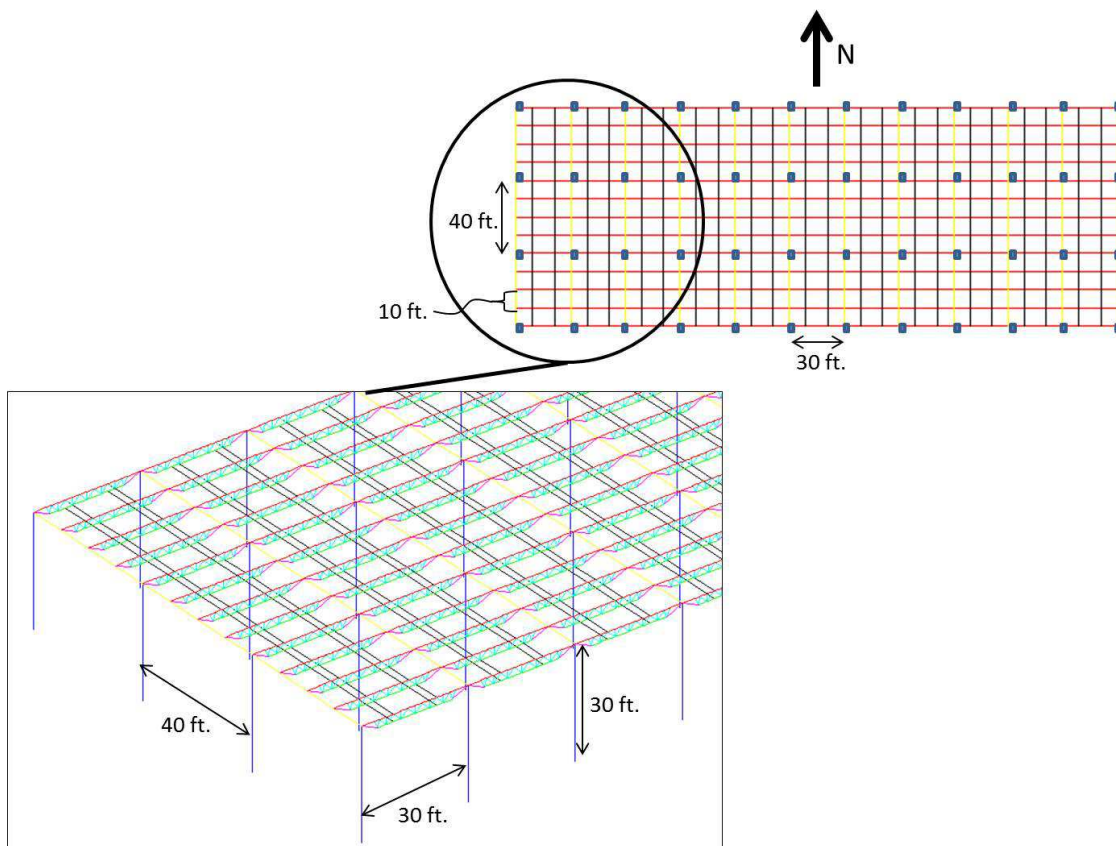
Plan view of the basic building with girders in yellow, joists in red, and bridging in black, a 3D view of a portion of the building accompanying
